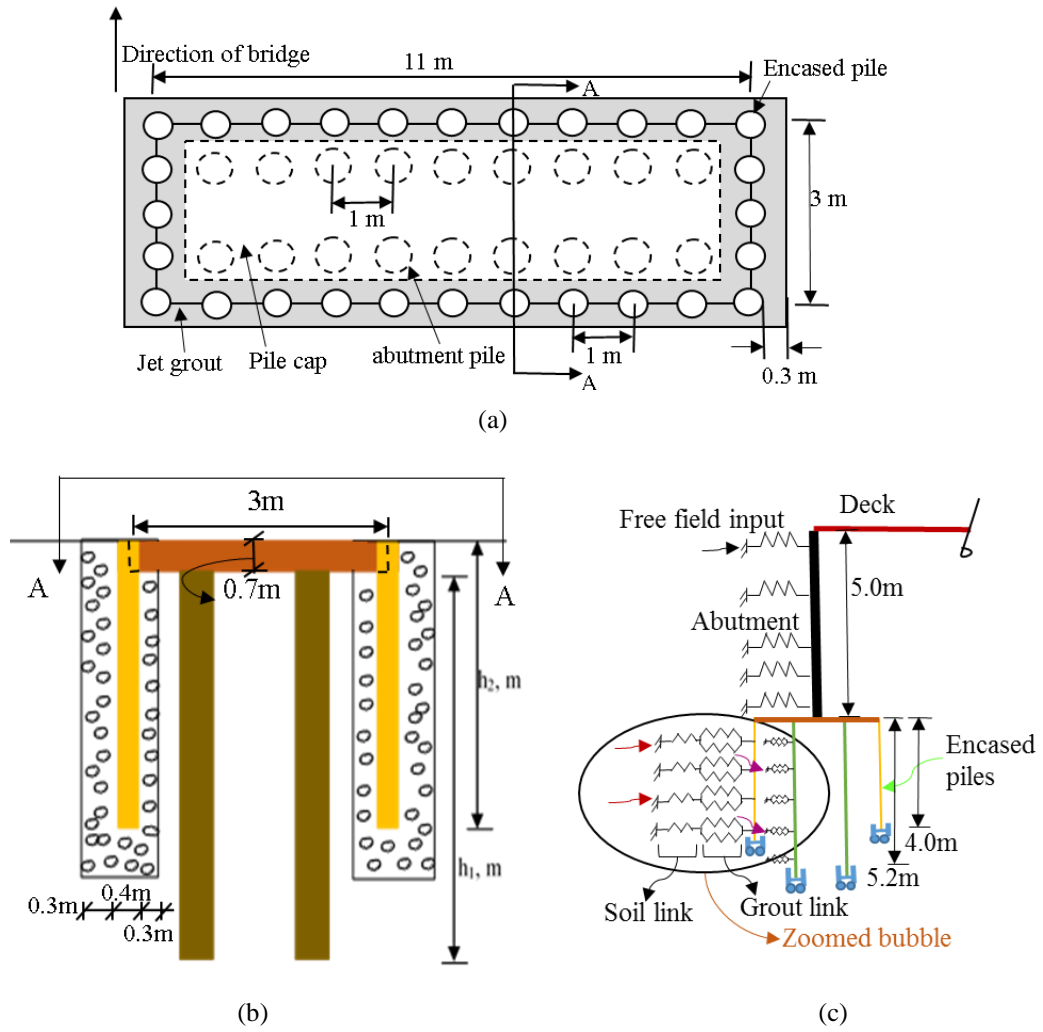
(a) Schematic diagram of retrofitted abutment foundation in plan, (b) vertical section A-A (h_1 = height of abutment pile; h_2 = height of encasement pile) and (c) spring-dashpot model of the abutment and its retrofitted foundation in medium stiff clay.
